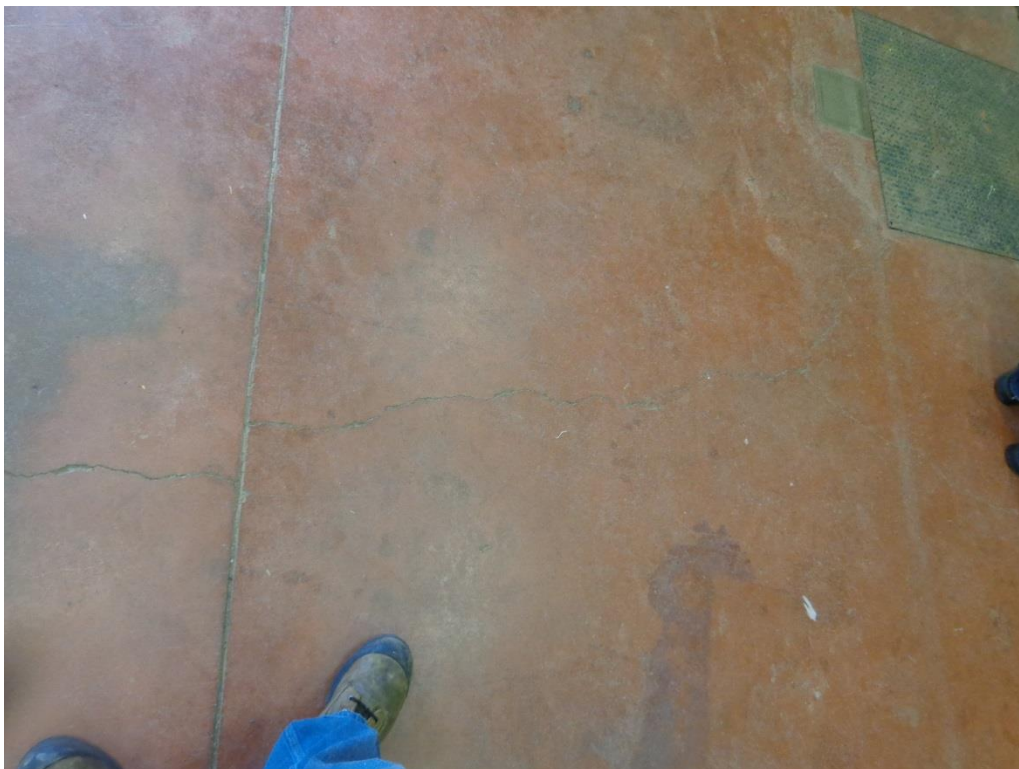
Shrinkage Cracks in Interior Slab
